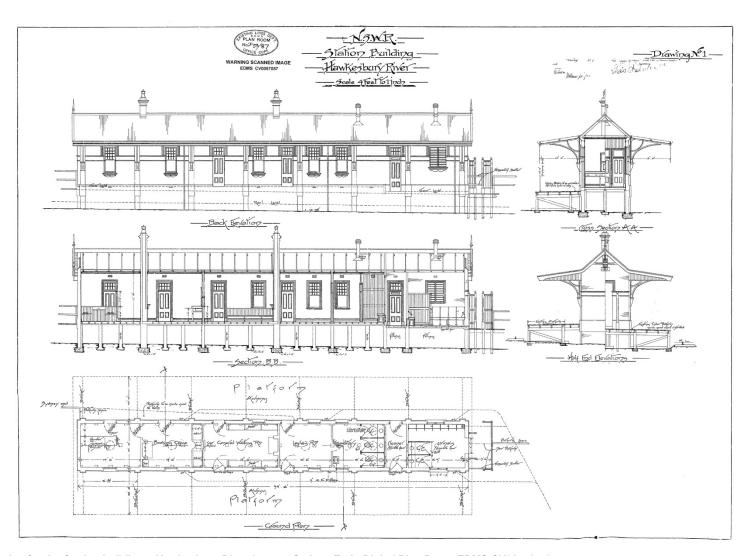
Design plan for the Station building – Hawkesbury River (source Sydney Train Digital Plan Room EDMS CV0057057)
